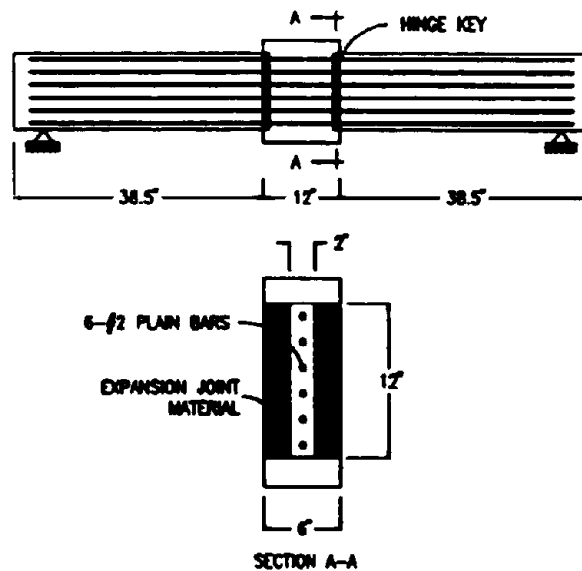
1/8-Scale Specimen Details (after Ref. 28).
